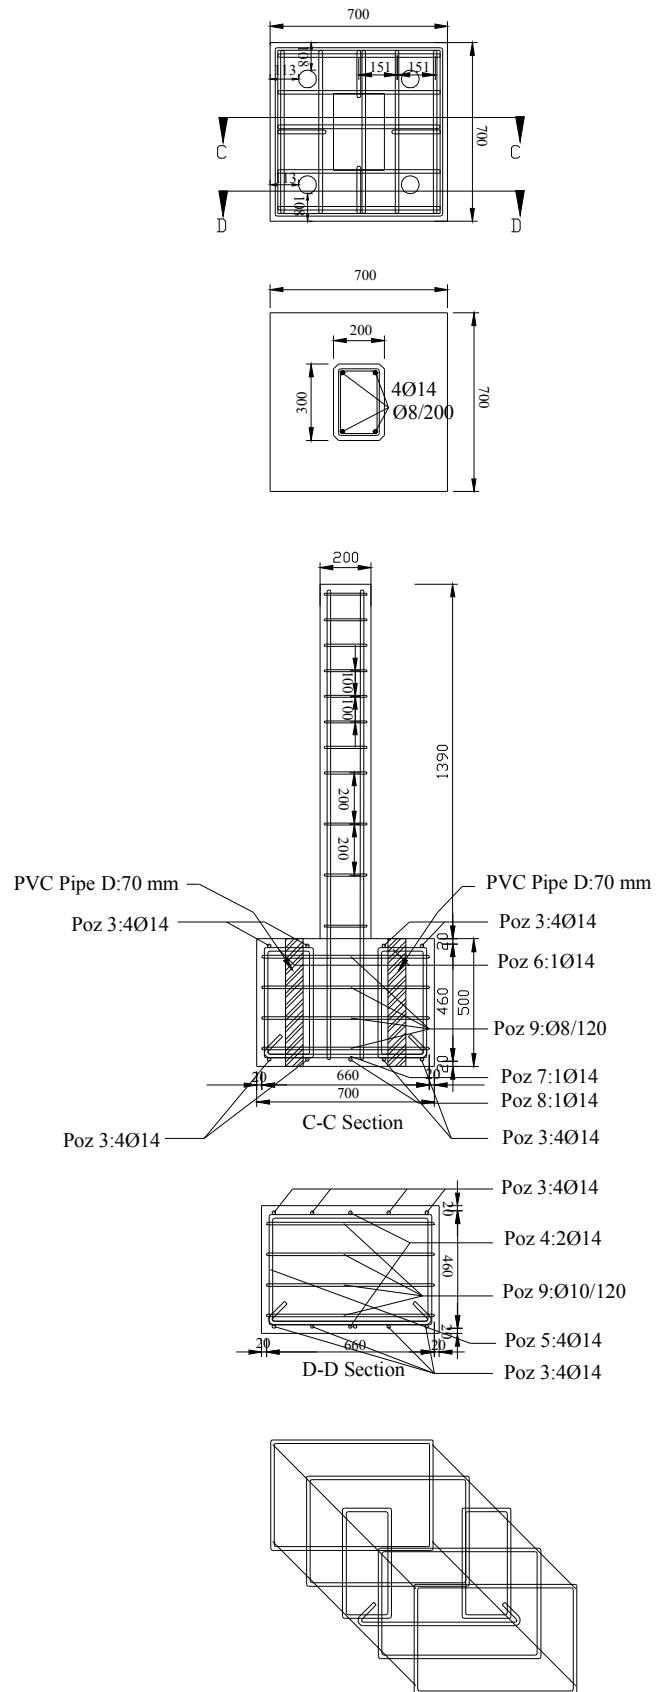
Reinforcing cage of the third type specimens (east side).
